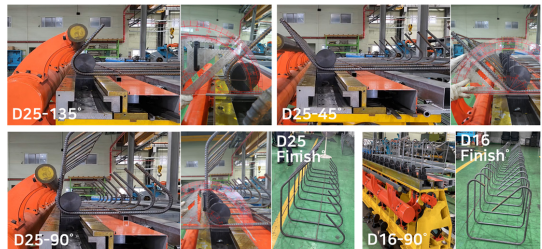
Bending performance test of equipment using welded bar reinforcement mat
